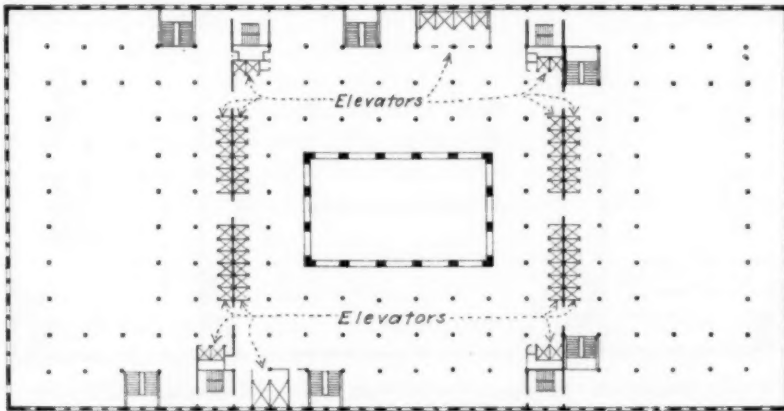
DEPARTMENT STORE FLOOR PLAN SHOWING PRESENT ARRANGEMENT OF FIRE WALLS, ELEVATORS AND STAIRS
